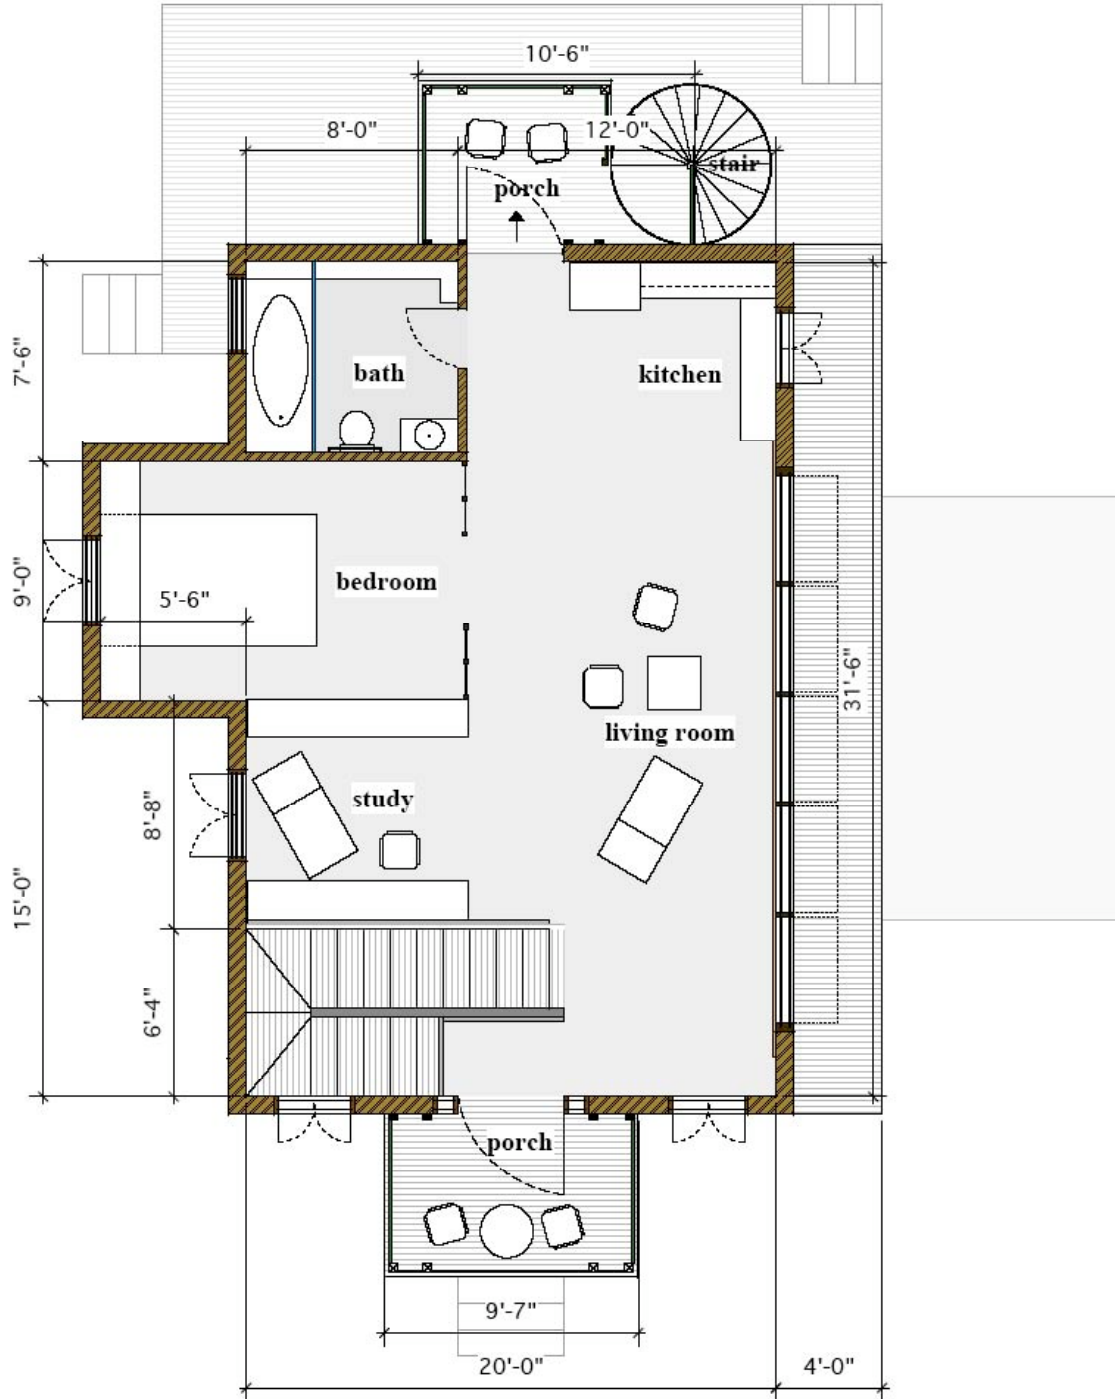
Floor plan- 2nd floor/ apartment level.
